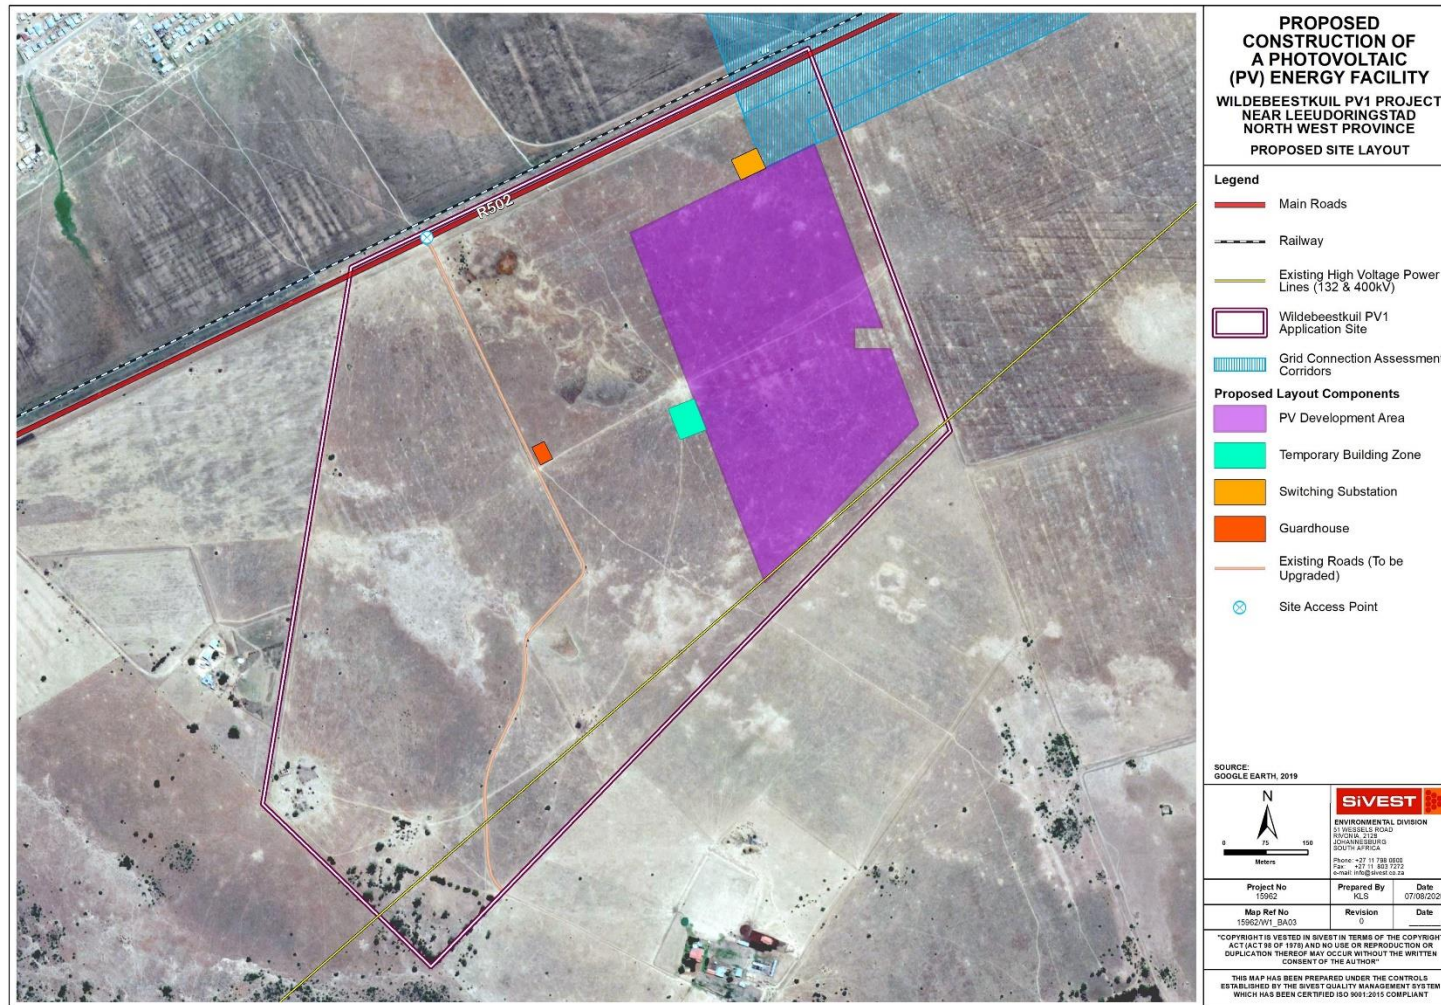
Wildebeestkuil 1 Solar PV Plant Layout
